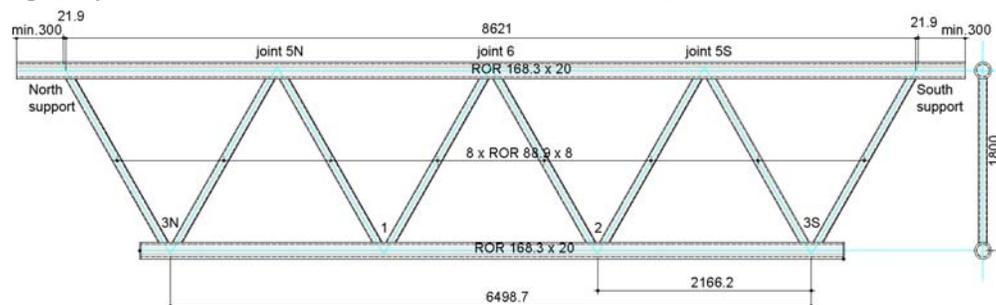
Elevation of a truss beam with dimensions and joint numbering
